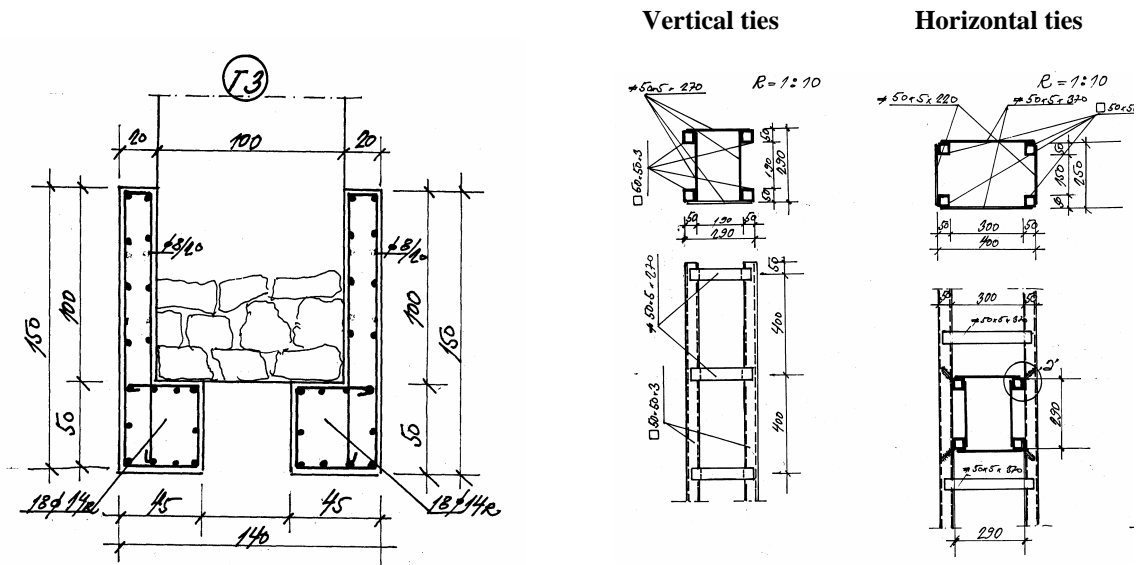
Detail of the foundation and of the horizontal and vertical steel ties
